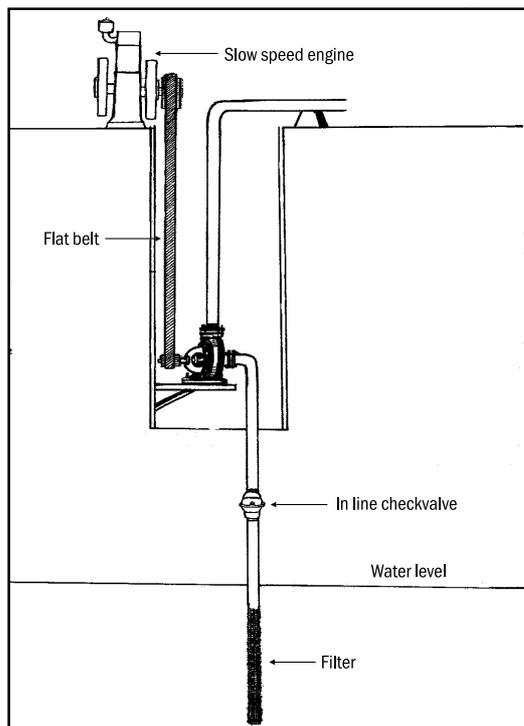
Typical deep-set arrangement with slow speed engine and belt drive
